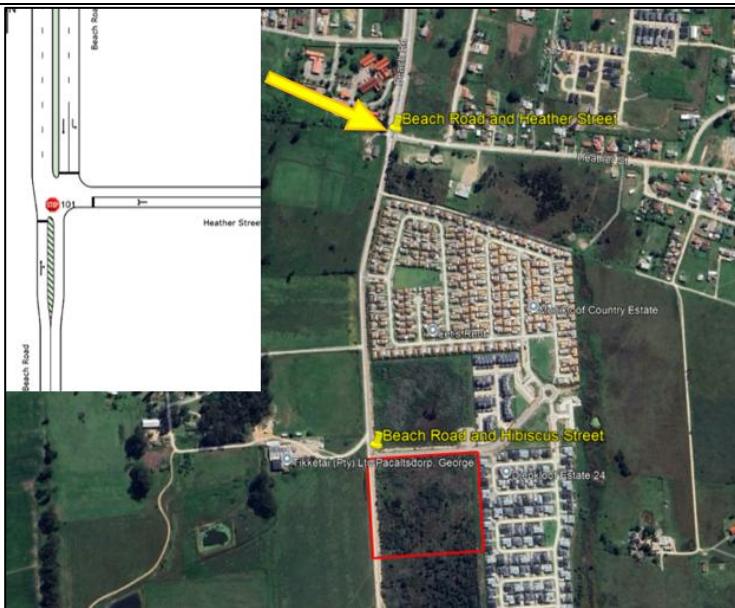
Existing Intersection Layout: Beach Road and Heather Street
